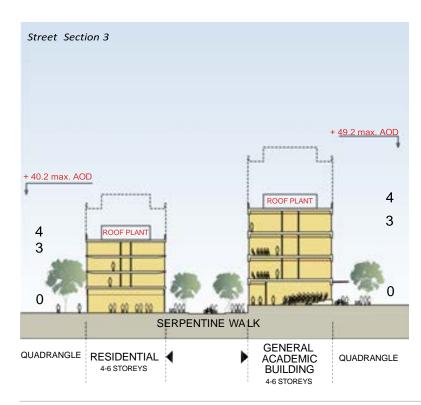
Section 3 illustrates a section along Serpentine Way through a 4-6 storey building (if in residential use) or a 4 storeys maximum building (if in non-residential use) and a general academic building of 4-6 storeys. Figure 4.10 establishes that the buildings will be a maximum of 39.5 and 49.2 metres above ordnance datum
